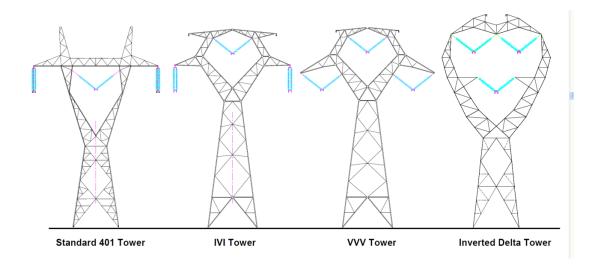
Outline Drawings of Lattice Steel Towers (not to scale)
